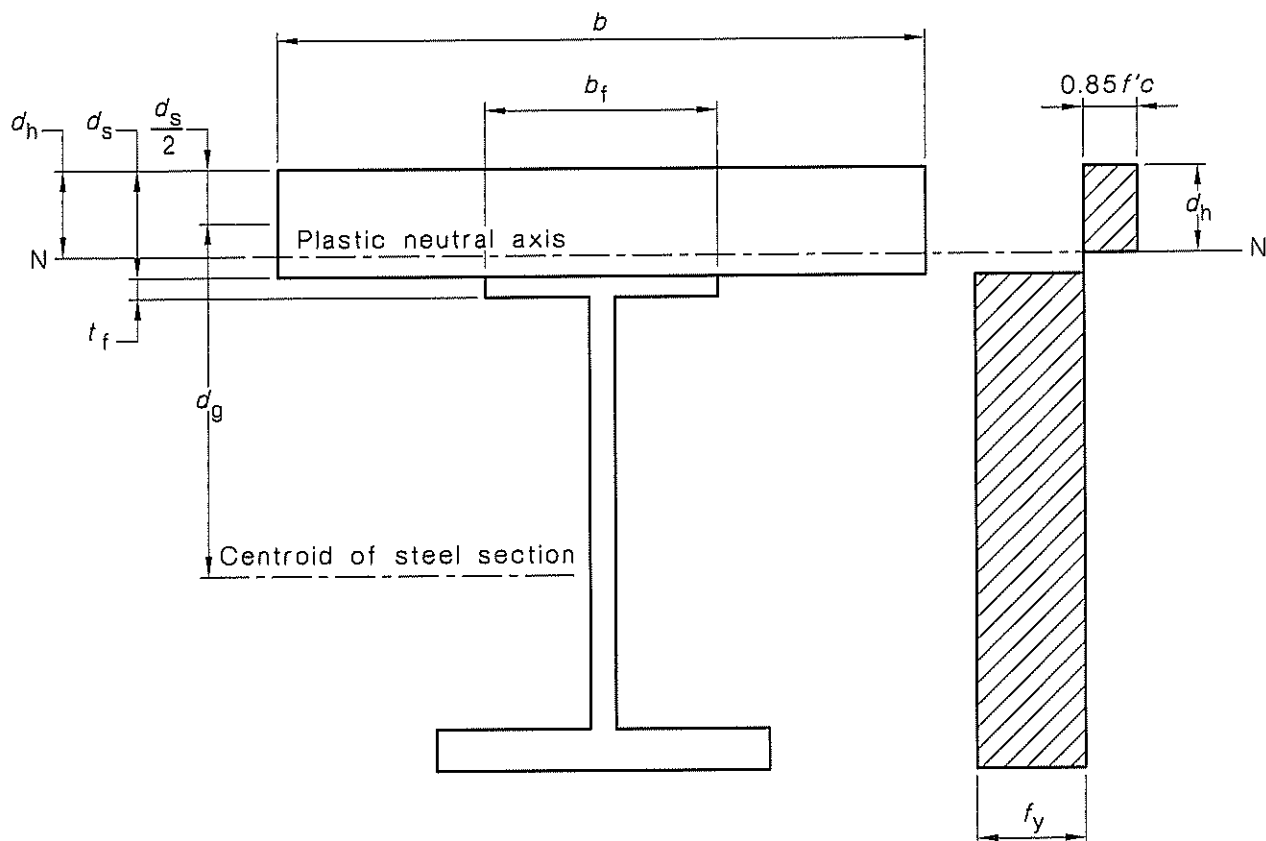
SECTION MOMENT CAPACITY COMPRESSION ZONE ENTIRELY WITHIN THE CONCRETE SLAB
